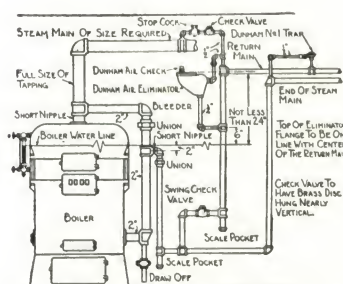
D. Method of Installing Eliminator Type 220B on Installations Using Boiler with One Supply Tapping
